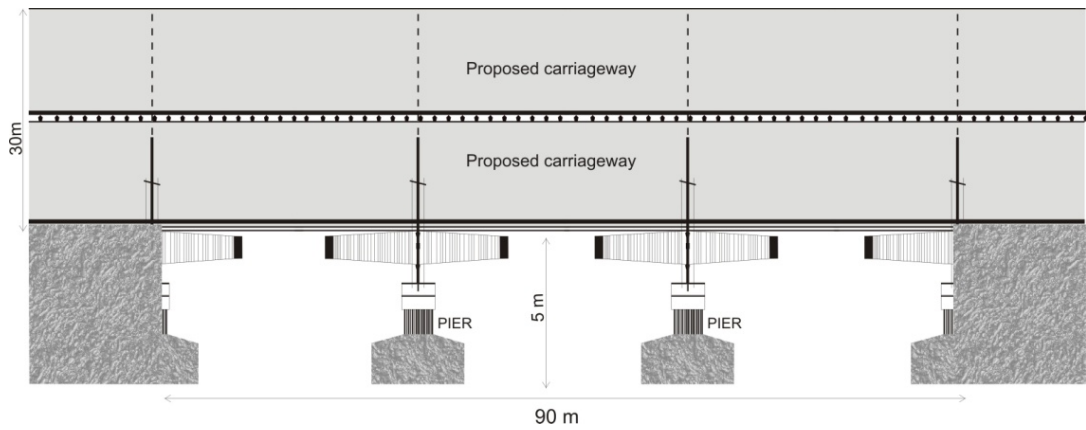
Proposed 90 m underpass to fauna crossing at 632.350.
